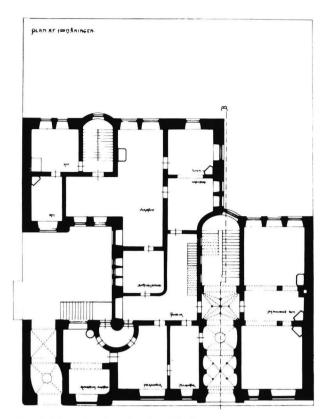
Final drawings for the Telephone Association building, 1903. First floor plan. The vaulting of the entrance passage was not executed as shown here. (HKRVVA).
